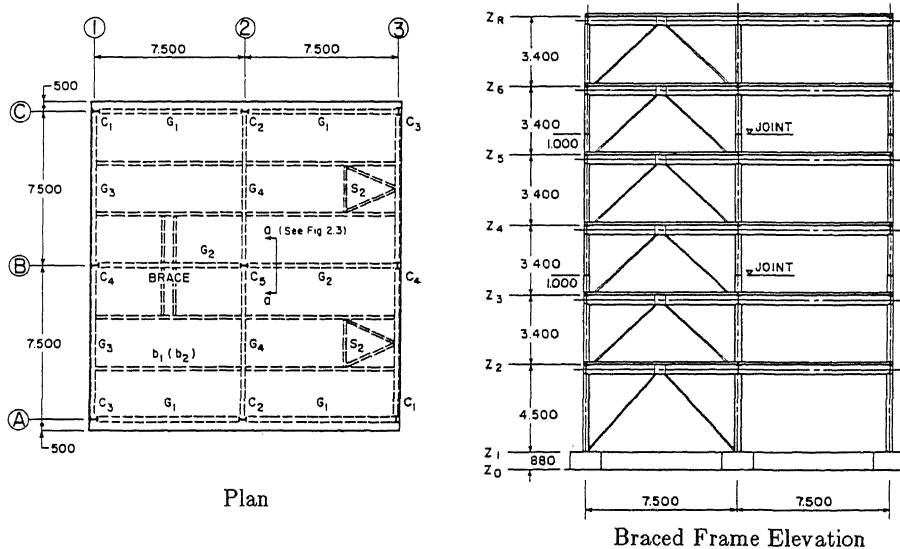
Full-Scale CBDS Plan and Elevation (mm)
